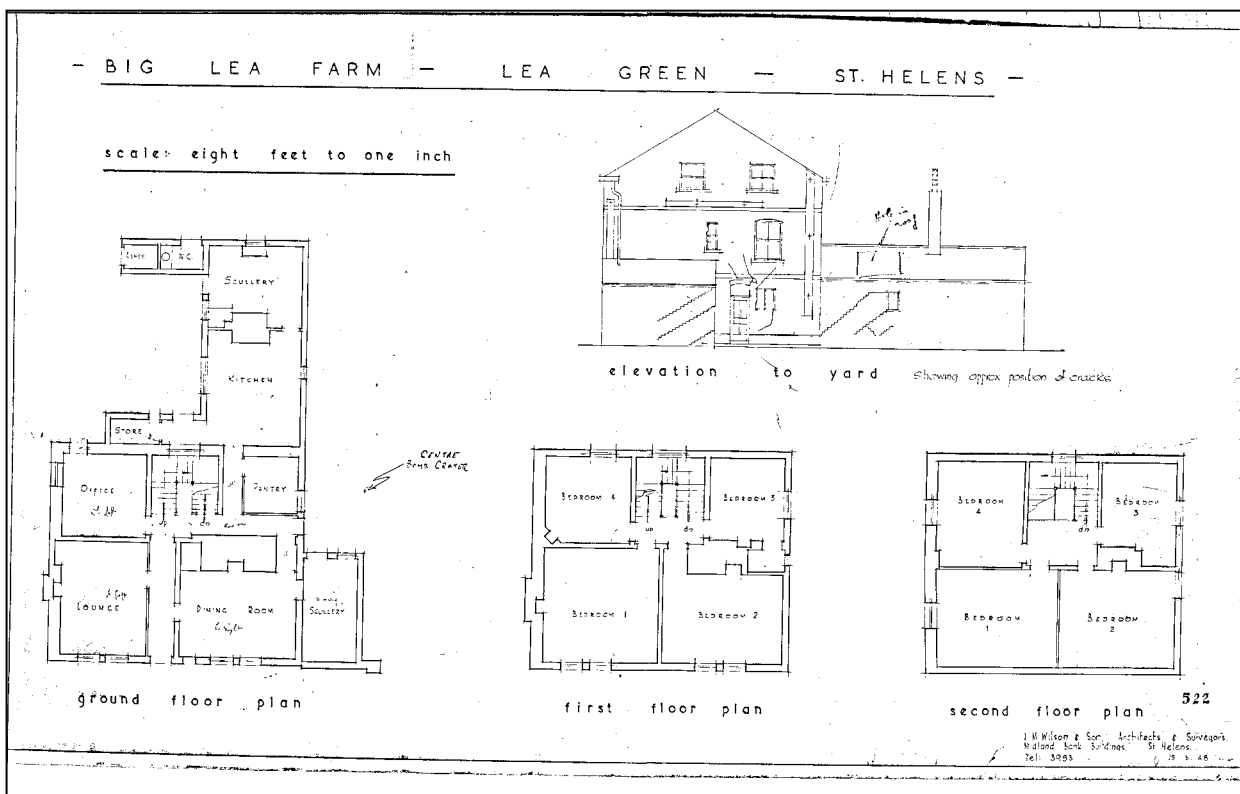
Architect's plan of farmhouse showing bomb damage, drawn 15 March 1948
